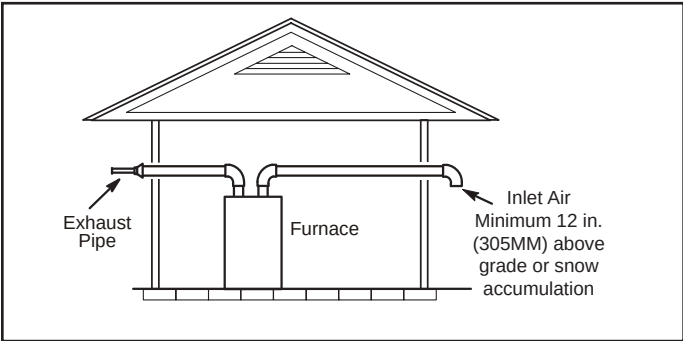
Exiting Exhaust and Intake Vent (no common pressure zone)
